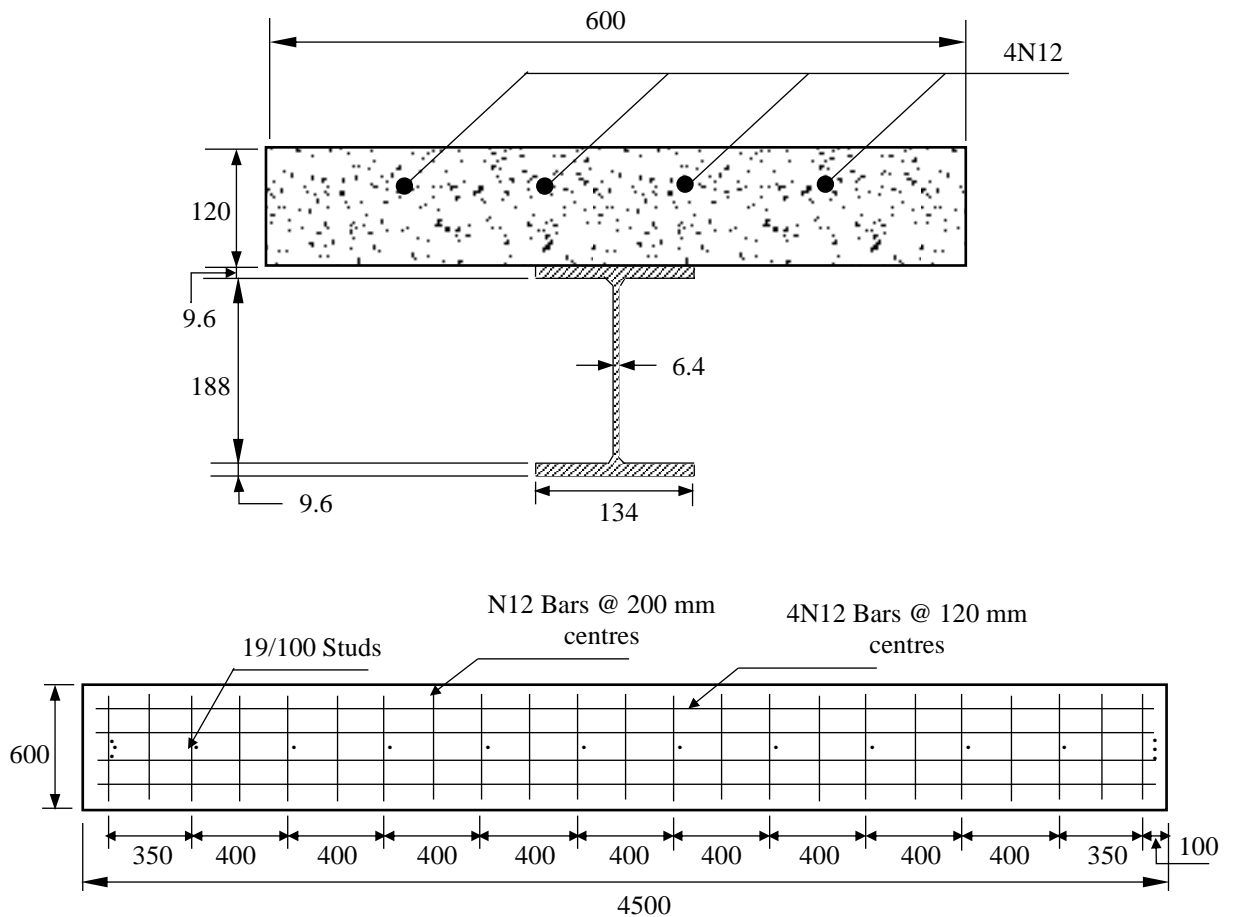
Composite beam cross-section and plan view of slab reinforcement and shear stud layout (all dimensions in mm)
